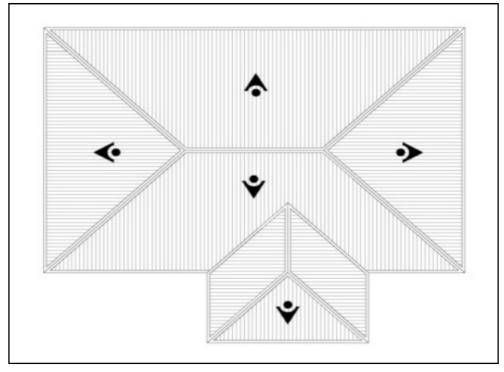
Roof Plan of Typical Post-colonial Igala Building. Source: Field Survey (2017).
